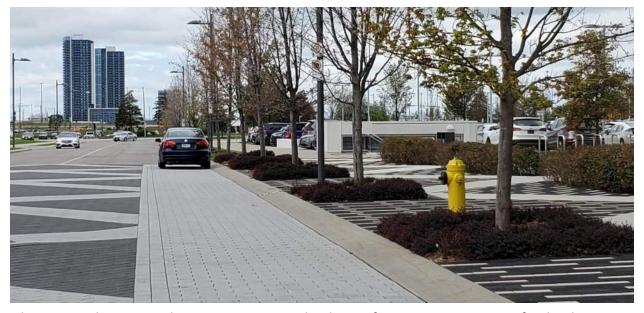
Hydrant at intersection of Peelar Road and Maplecrete Road (facing North), Southern Portion of Study Area
